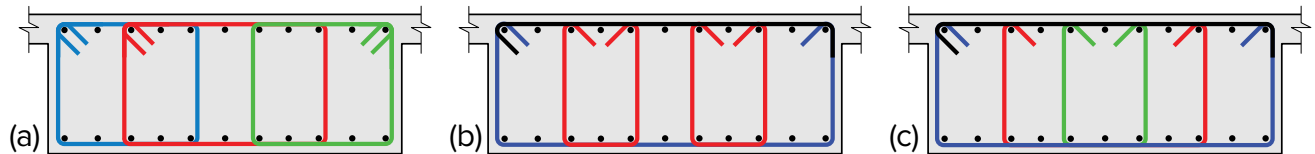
Potential multi-leg stirrup configurations for a wide beam: (a) multiple closed stirrups across the width of a beam (not constructable); (b) an open-top perimeter stirrup with nested internal open-top stirrups; and (c) an open-top perimeter stirrup with two internal open-top stirrups. Detail (c) is preferred, as Details (a) and (b) will require stacking of three stirrups and can cause congestion.
